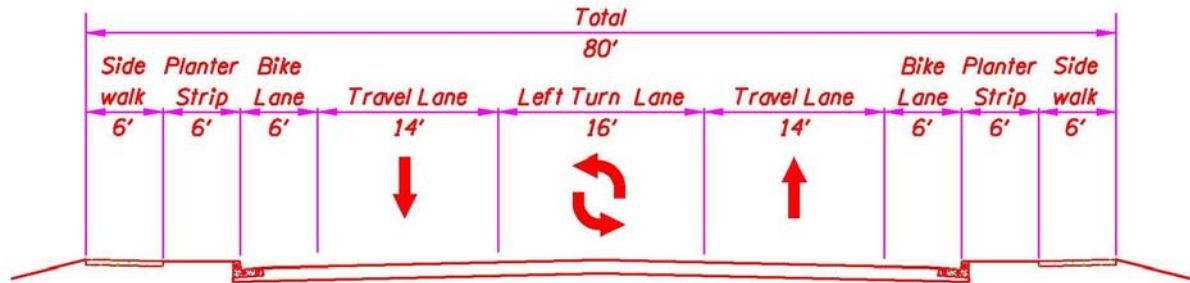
Cross Section between Brosterhous Road and 15th Street (for Alternatives B, C, D, and E)
